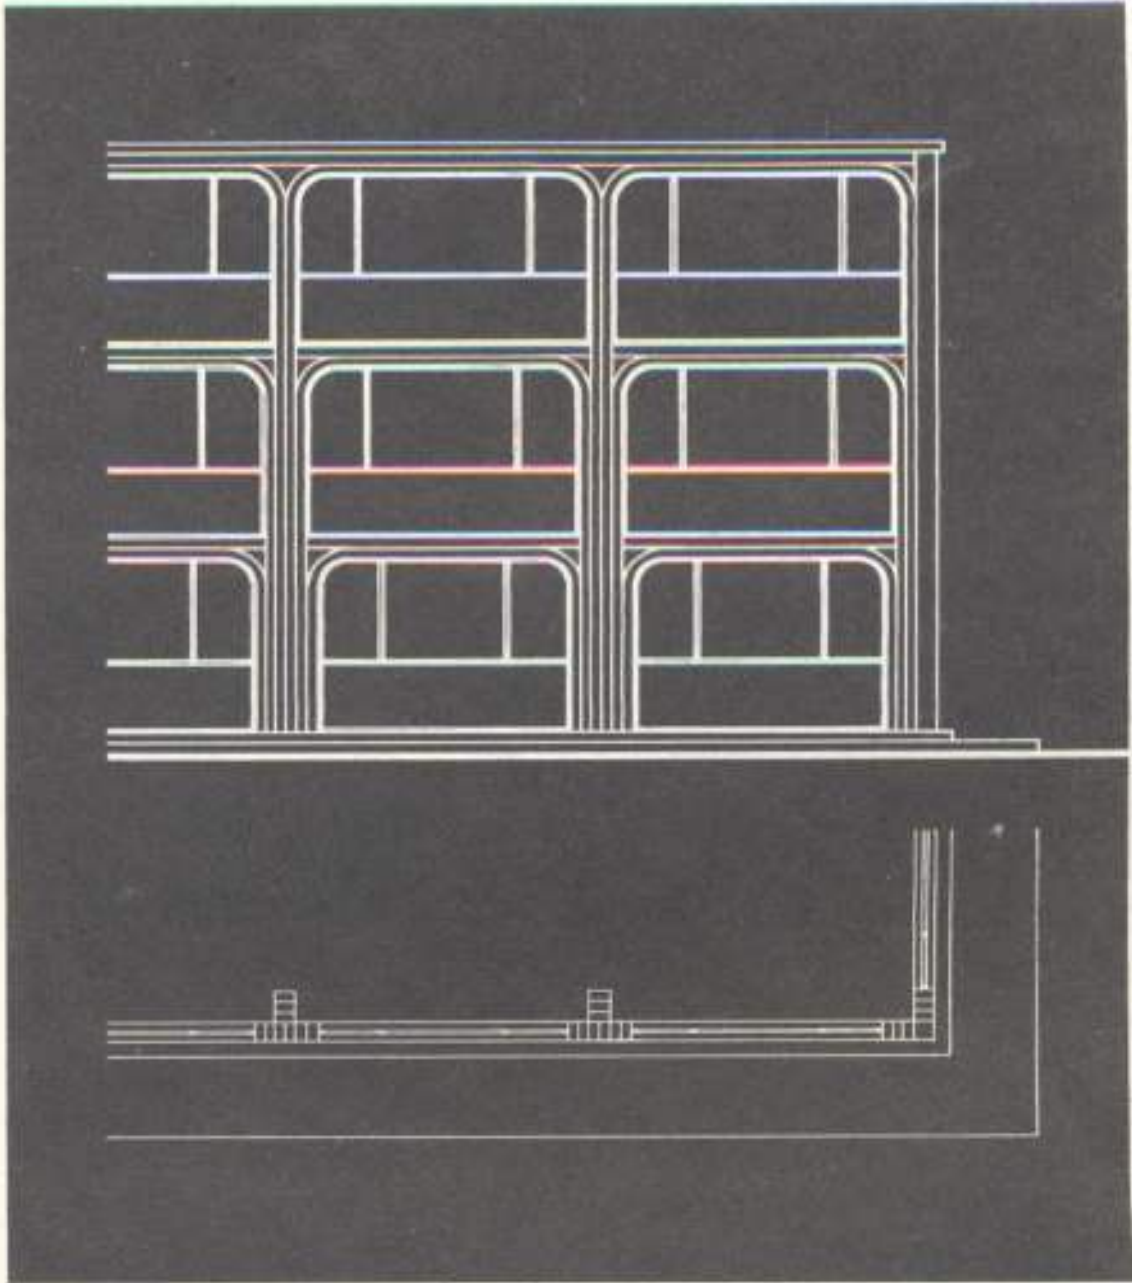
Elevation and plan of a building with continuous, extruded structural members.
